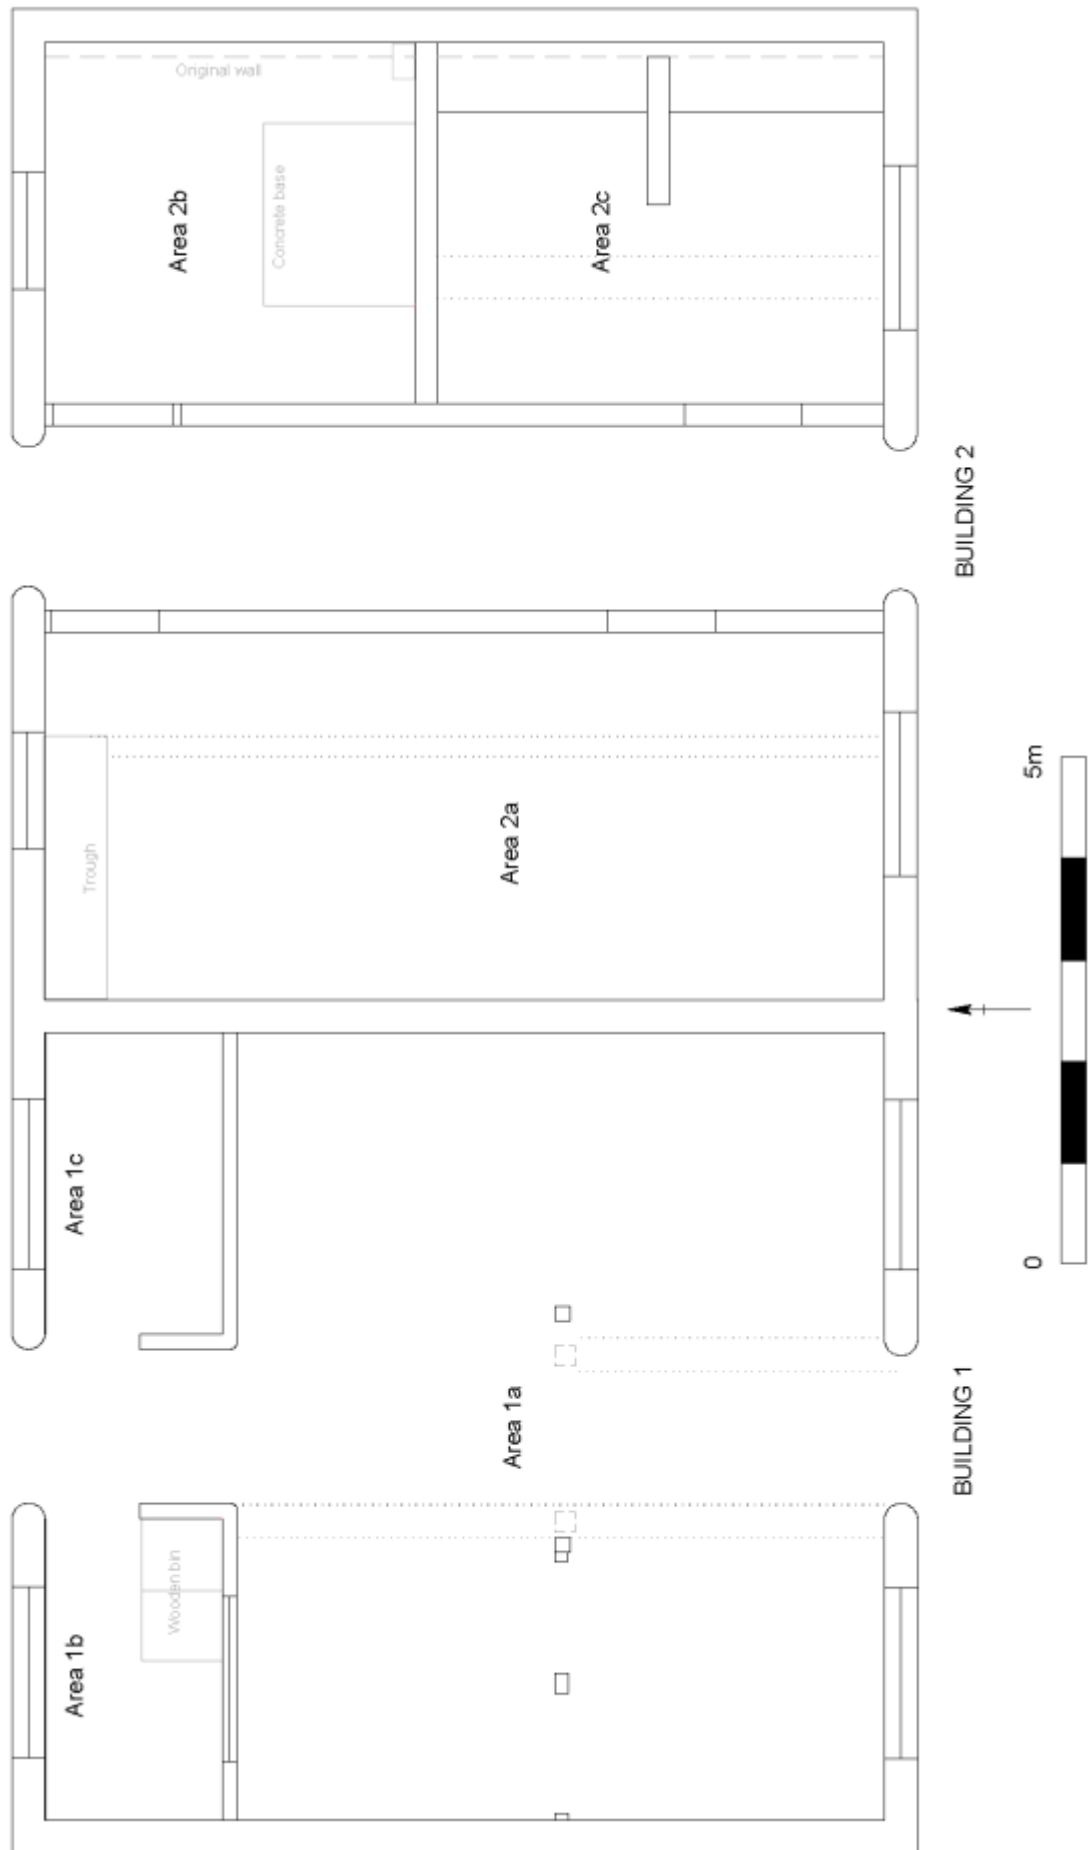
Buildings 1 & 2, Floor Plan, (scale as shown)
